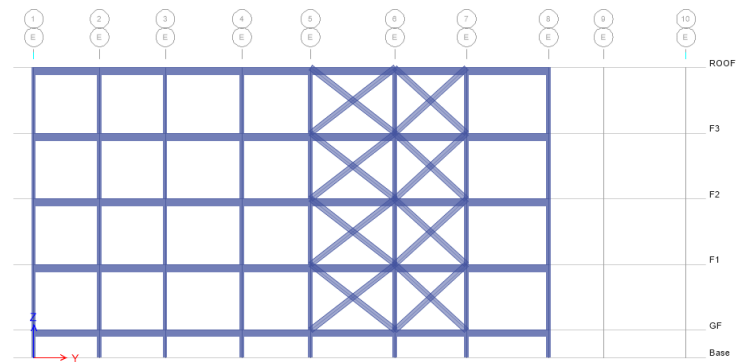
4 Y directional bracing of FE Model (Elevation-E)
